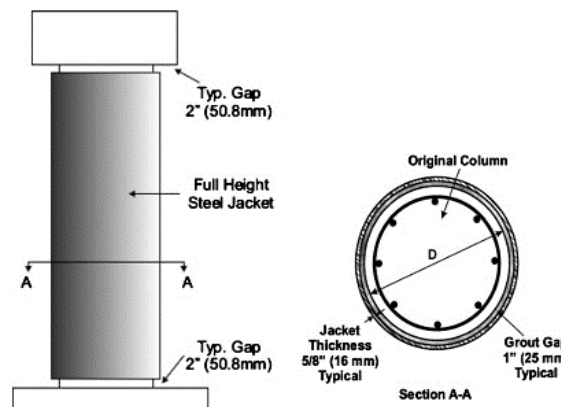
Details of a typical full-column steel jacket (FHWA, 2006).
